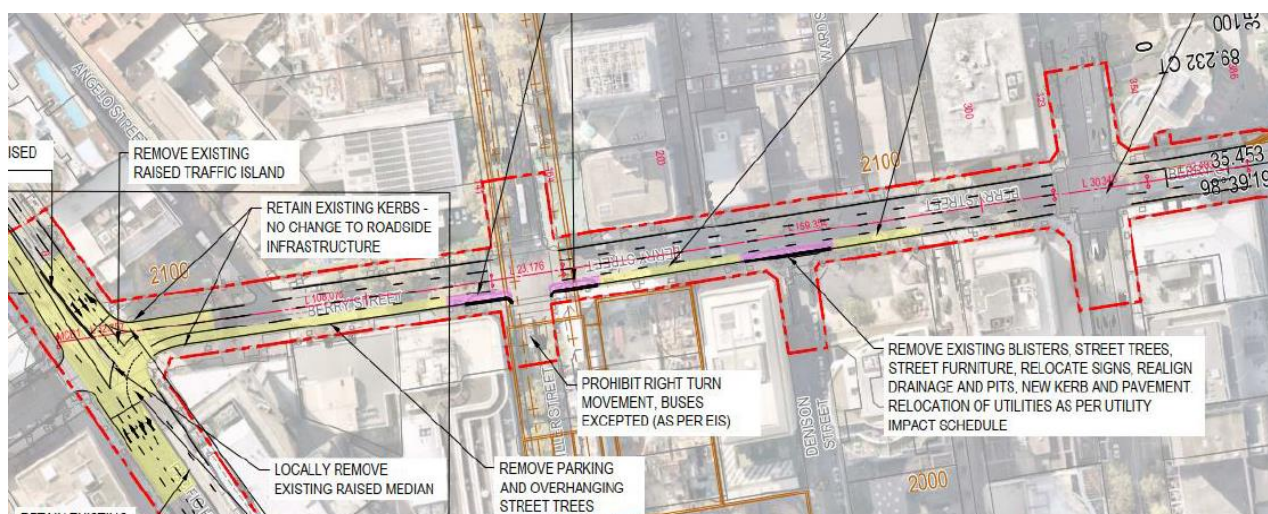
Alterations proposed to Berry St by the WHT project will prevent the improvements to walking, cycling and landscaping that are key to the successful operation of the Metro and other projects (Source: Acciona)
